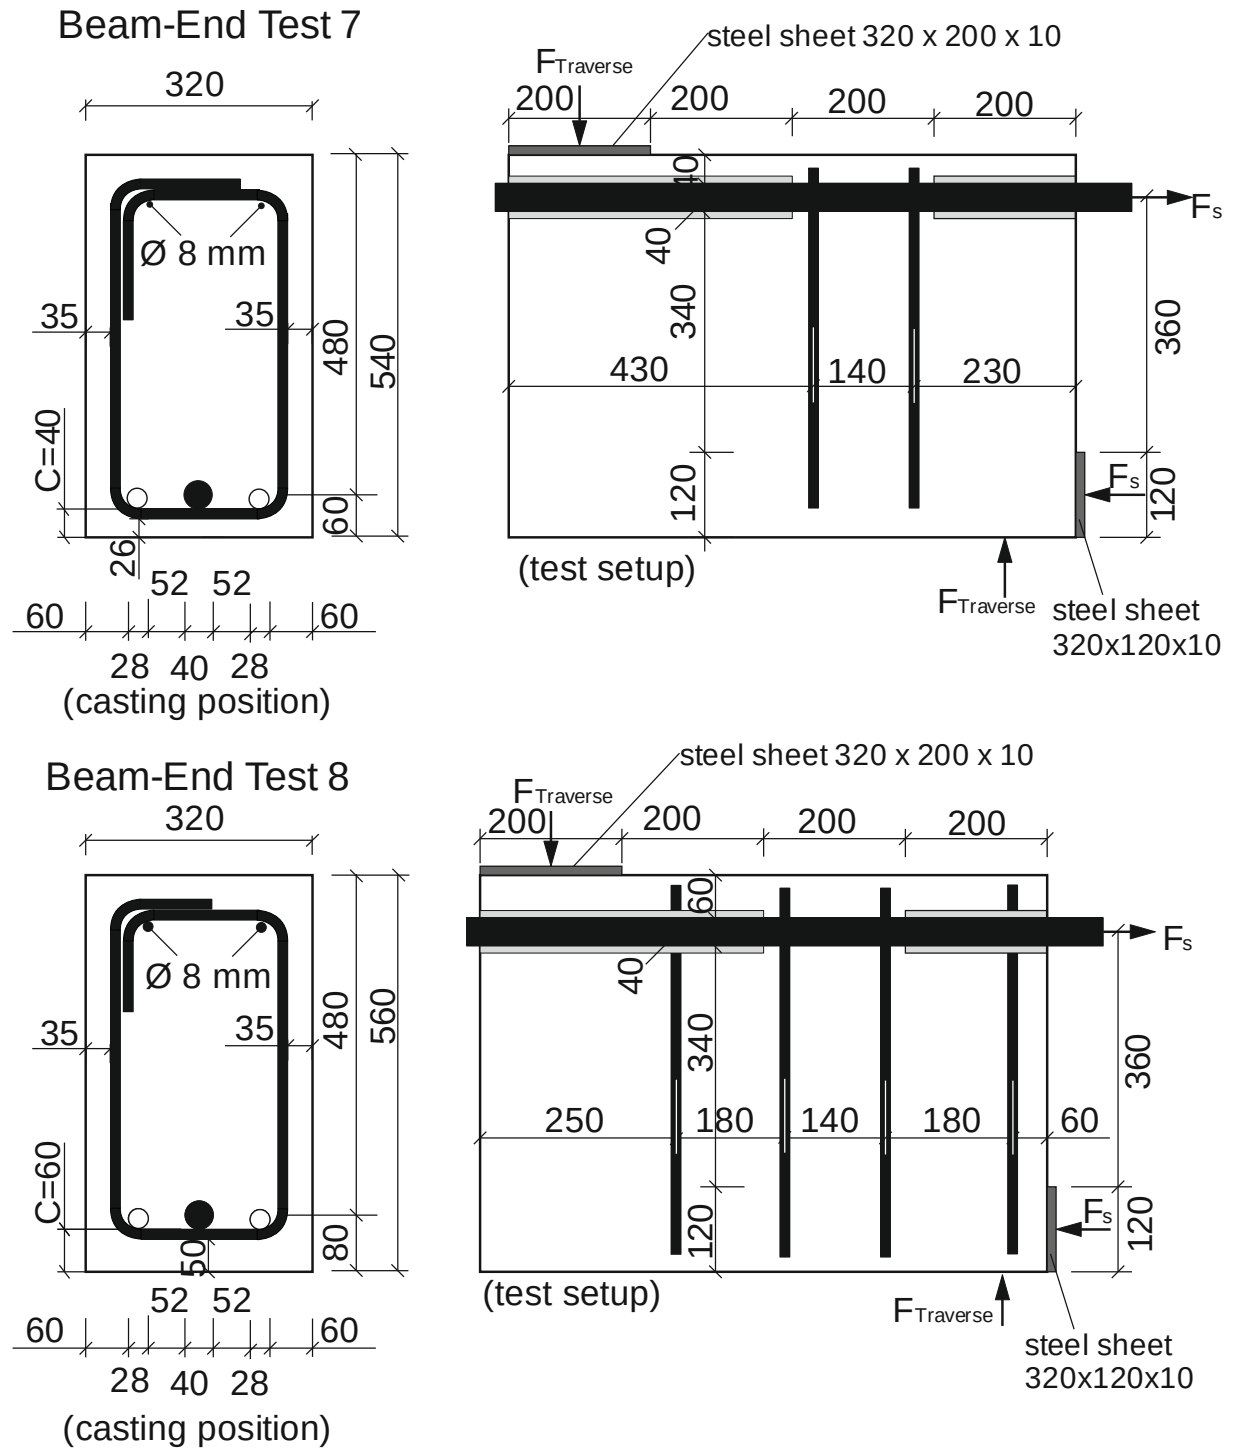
Reinforcement layout of Beam-End Tests 7 and 8
